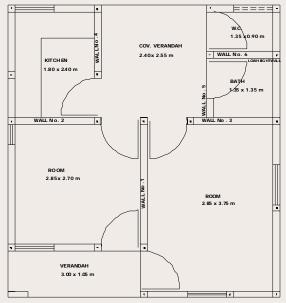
Plan of Standard House Design (Two Room Unit - Plinth Area-45.6 sq.m)
